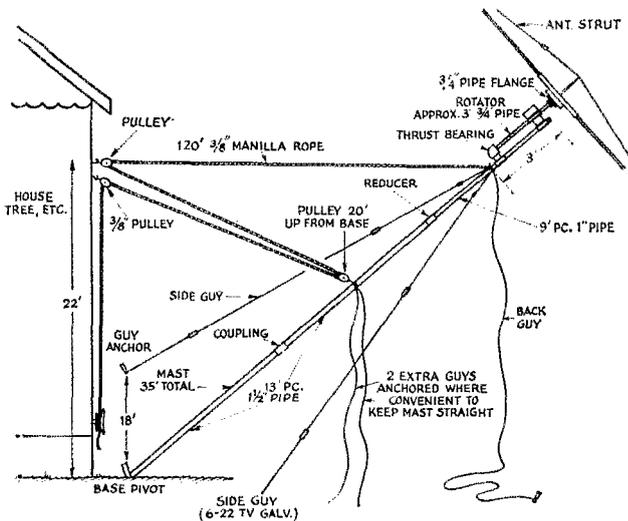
This simple pipe mast can be raised and lowered by one man. Details of construction will be found in the text.
